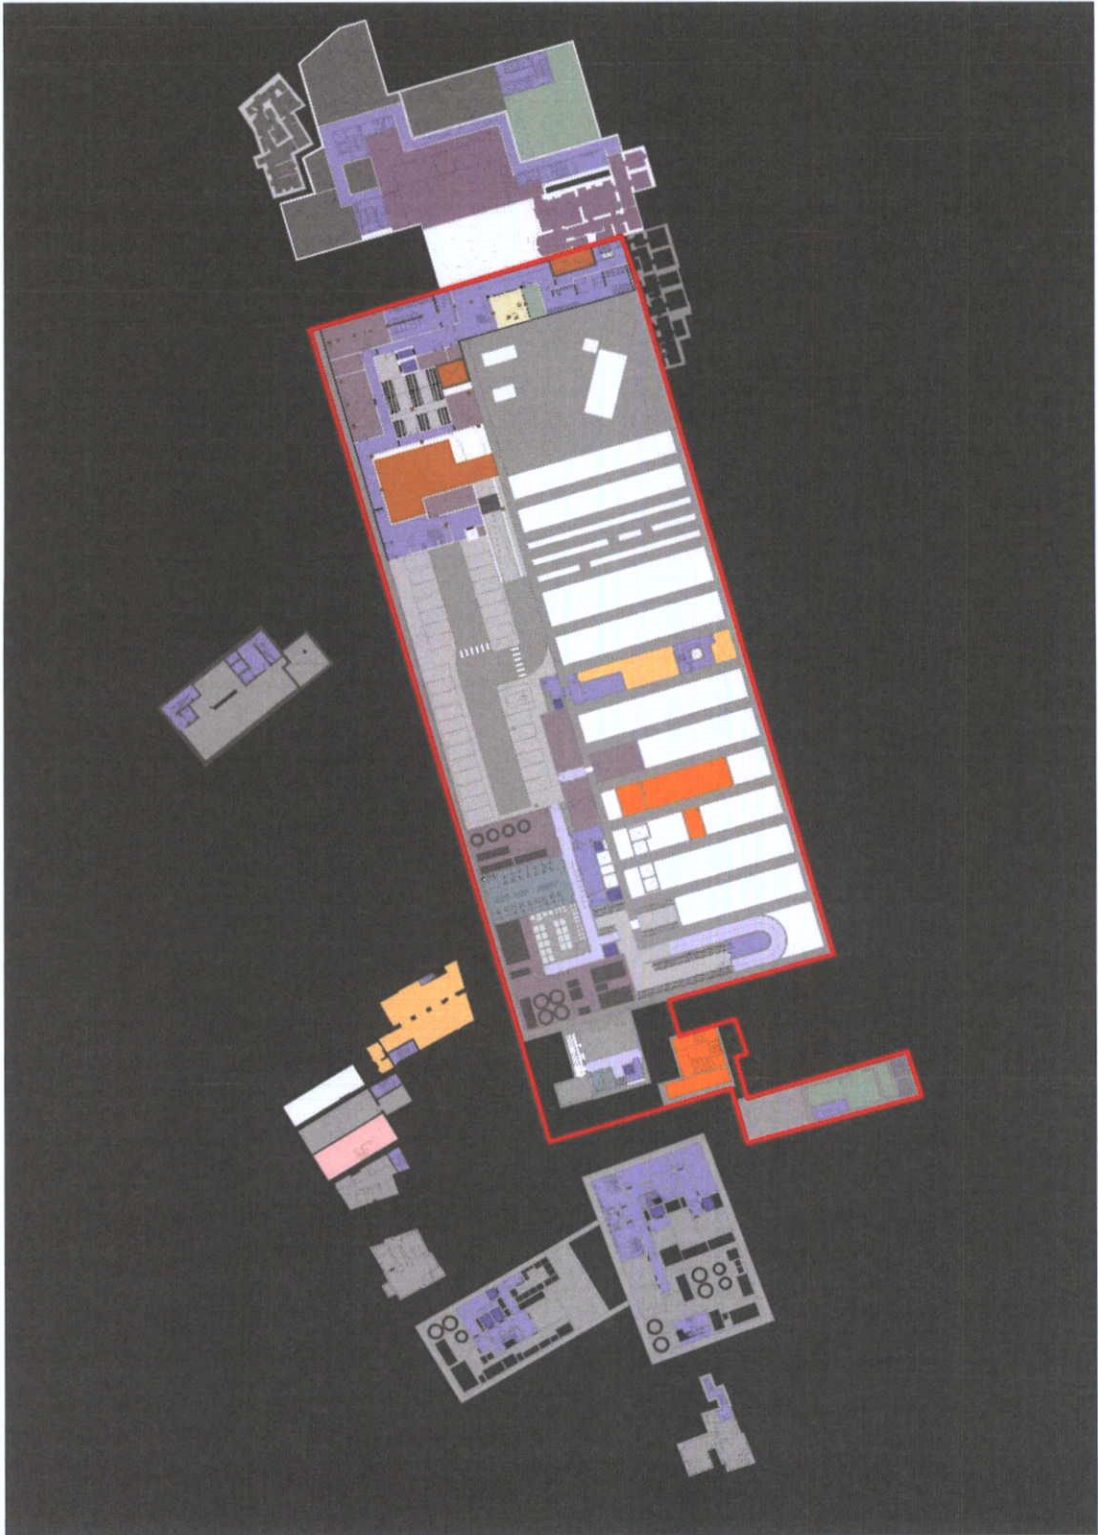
Site 2AB, Site 2C and No. 61 O'Connell Street Upper Layout – Basement Level.
